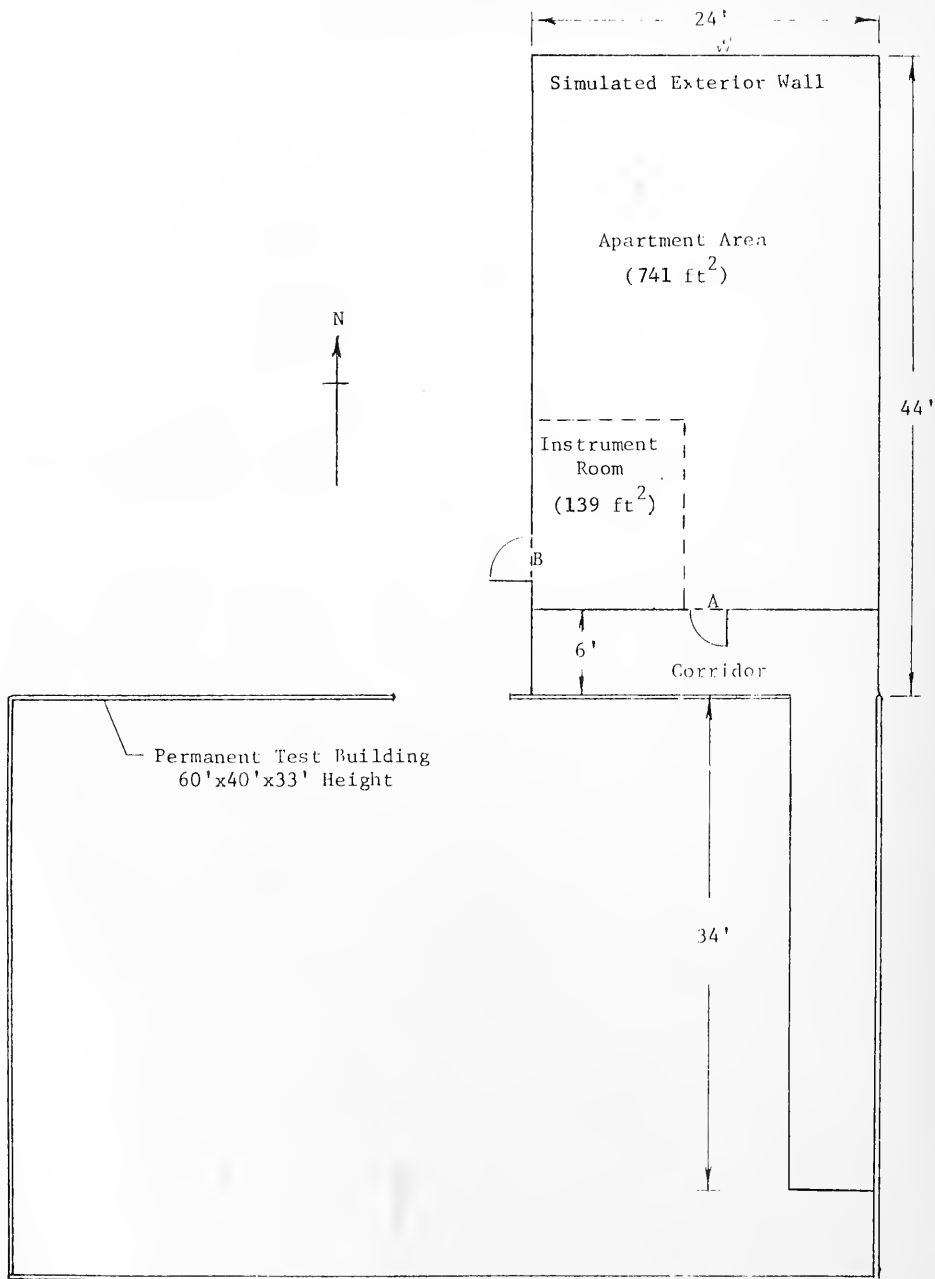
TEST STRUCTURE RELATIVE TO EXISTING TEST BUILDING
